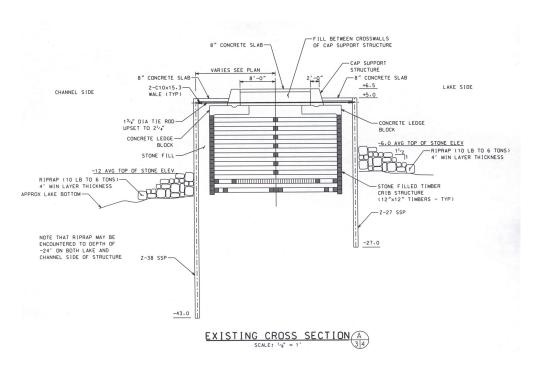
Existing Timber Crib Cross Section with new SSP Installation
